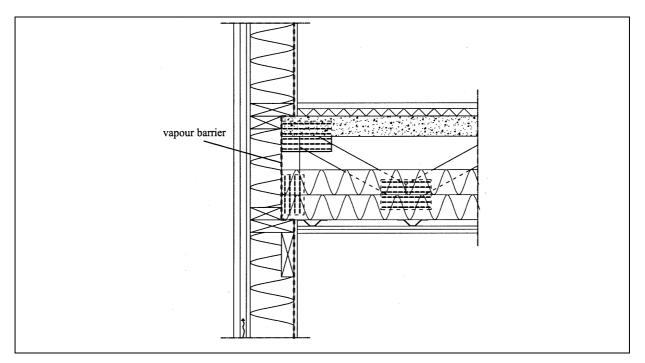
An example of a floor - supporting wall connection showing the vapour barrier position
